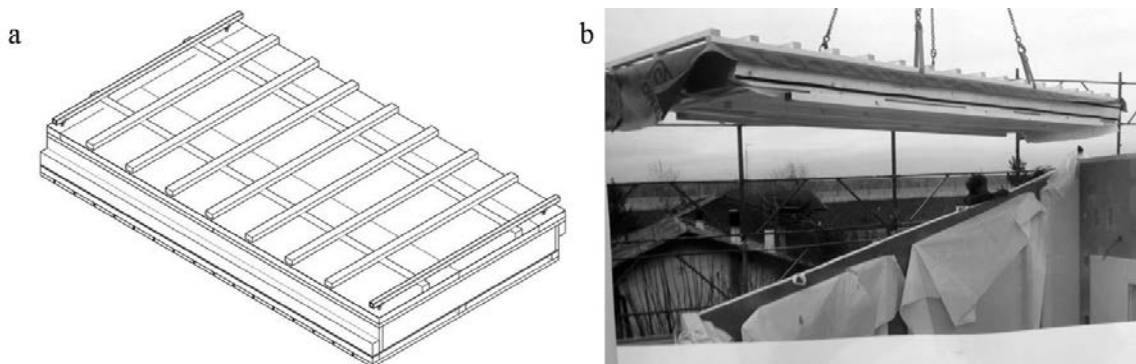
a) Structure of the Habitat panel; b) on-site installation of a similar preassembled roofing module.
